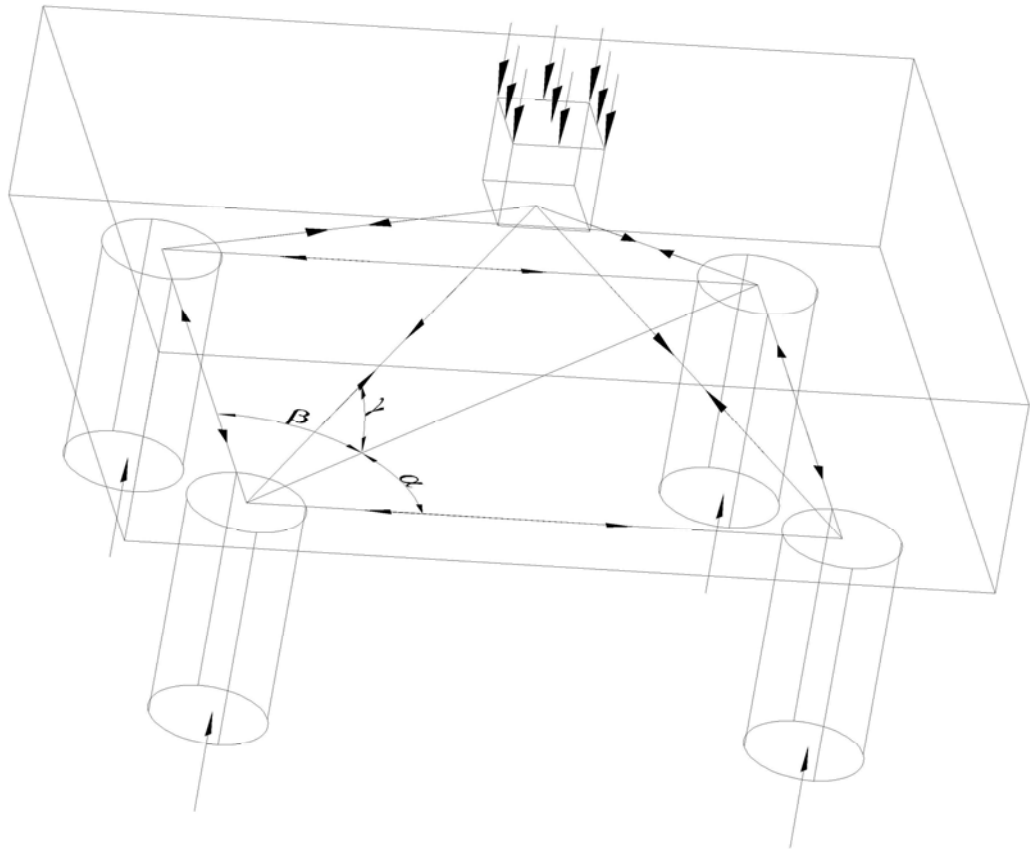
Strut-and-tie system assumed in a pile cap under a concentrated load or a wall loading
